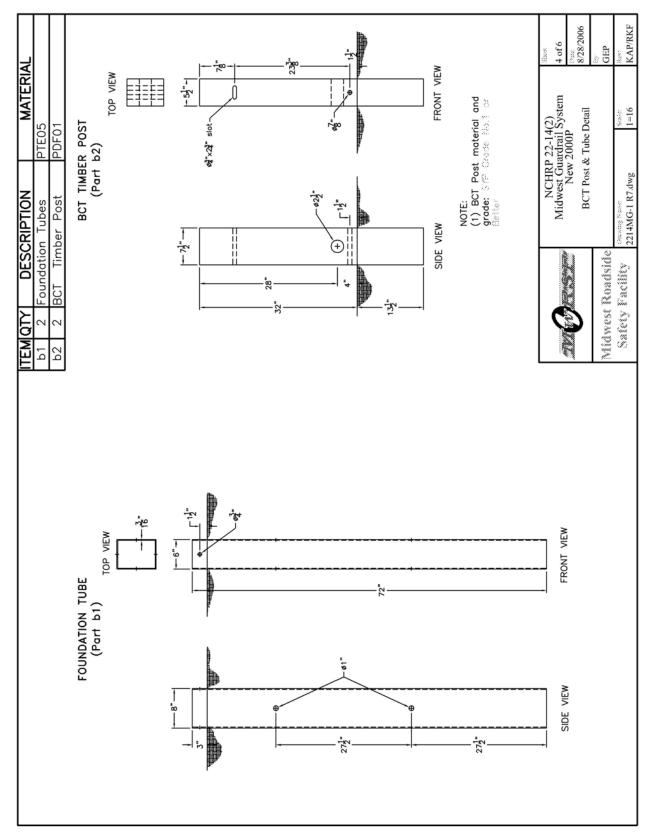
Midwest Guardrail System Anchorage Details (English)
